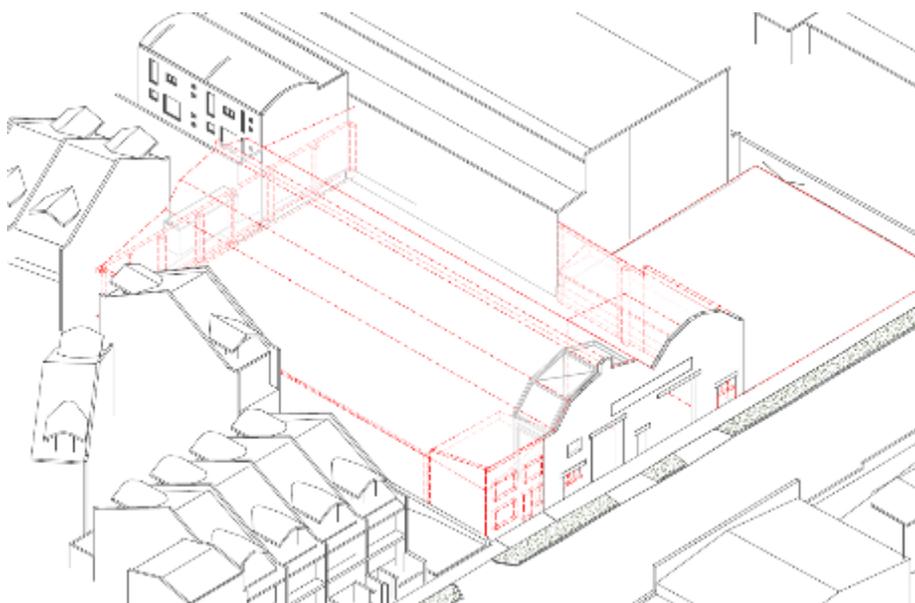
3D drawing showing proposed demolition and elements to be retained
